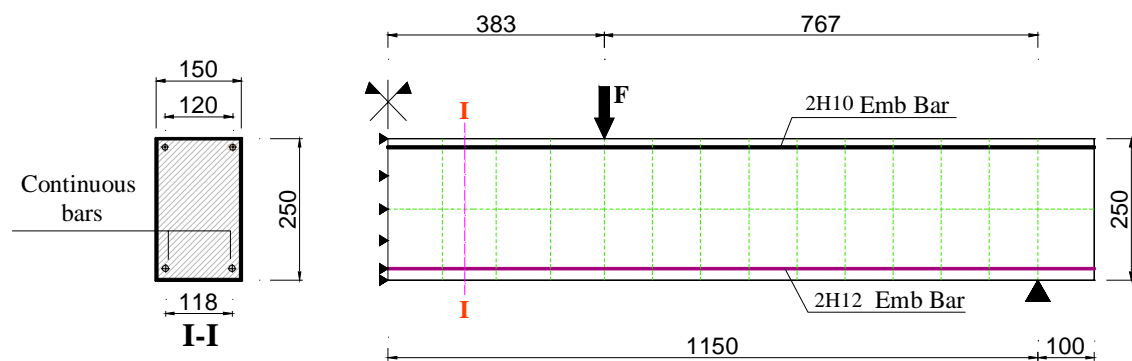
Geometry of the well-designed specimens (half beam, mm)
